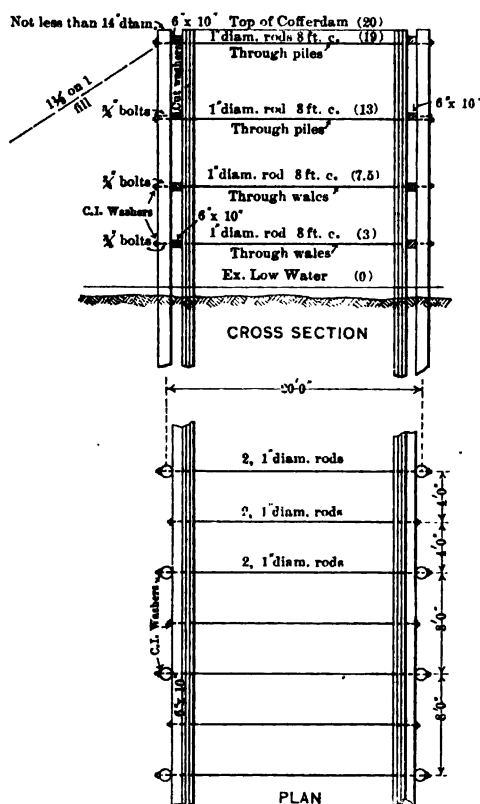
(a).—COFFER-DAM LAKE WASHINGTON CANAL LOCK.
